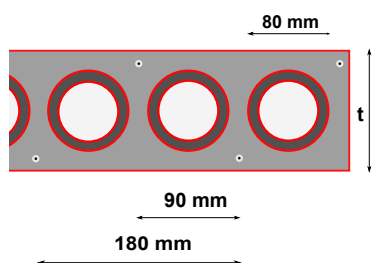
Section of a vault with one layer of fusée elements reinforced with main rebars positioned parallel to the span.
